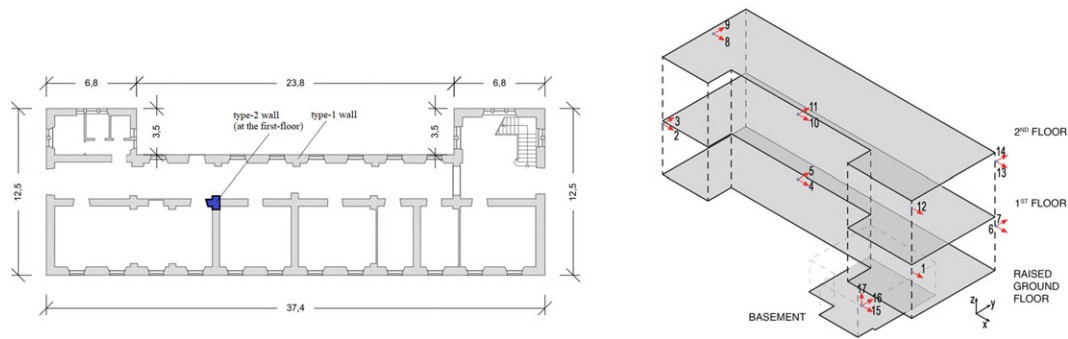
The plan of the raised floor reporting the main dimensions (in meters; left), scheme of the accelerometers installed on the Town Hall of Pizzoli (AQ; right)
